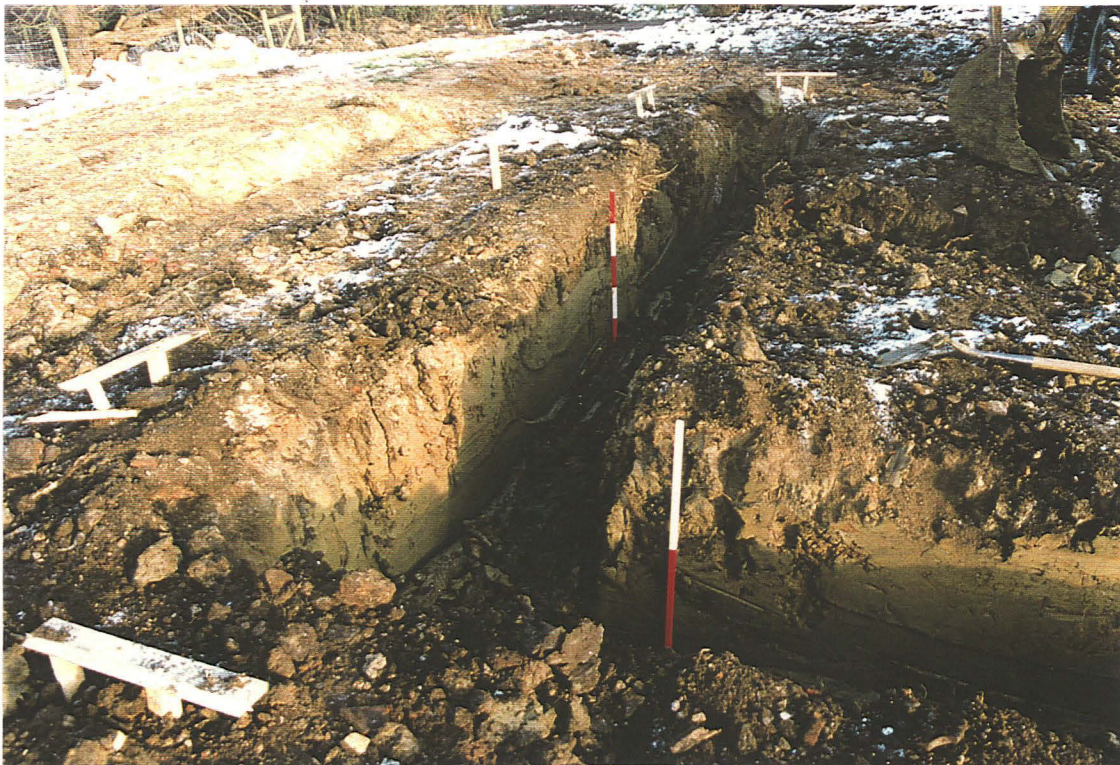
Close-up of section faces in north-west corner of building plot, looking east
